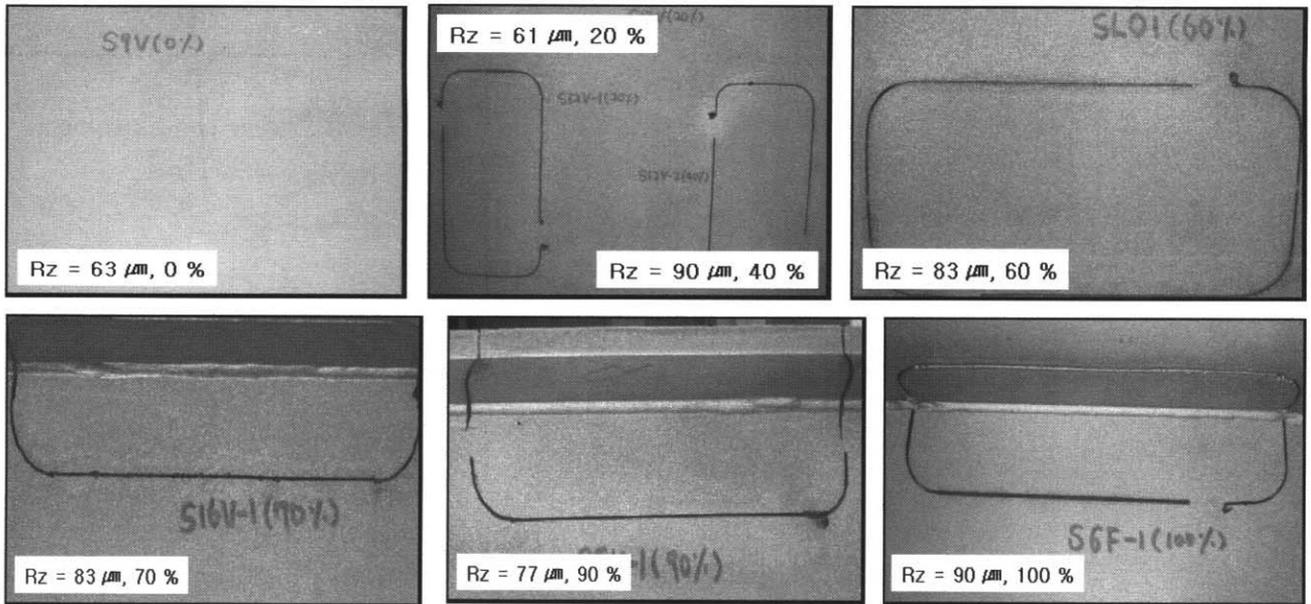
Typical surface condition of the PCP coated blocks right after sweep blasting
